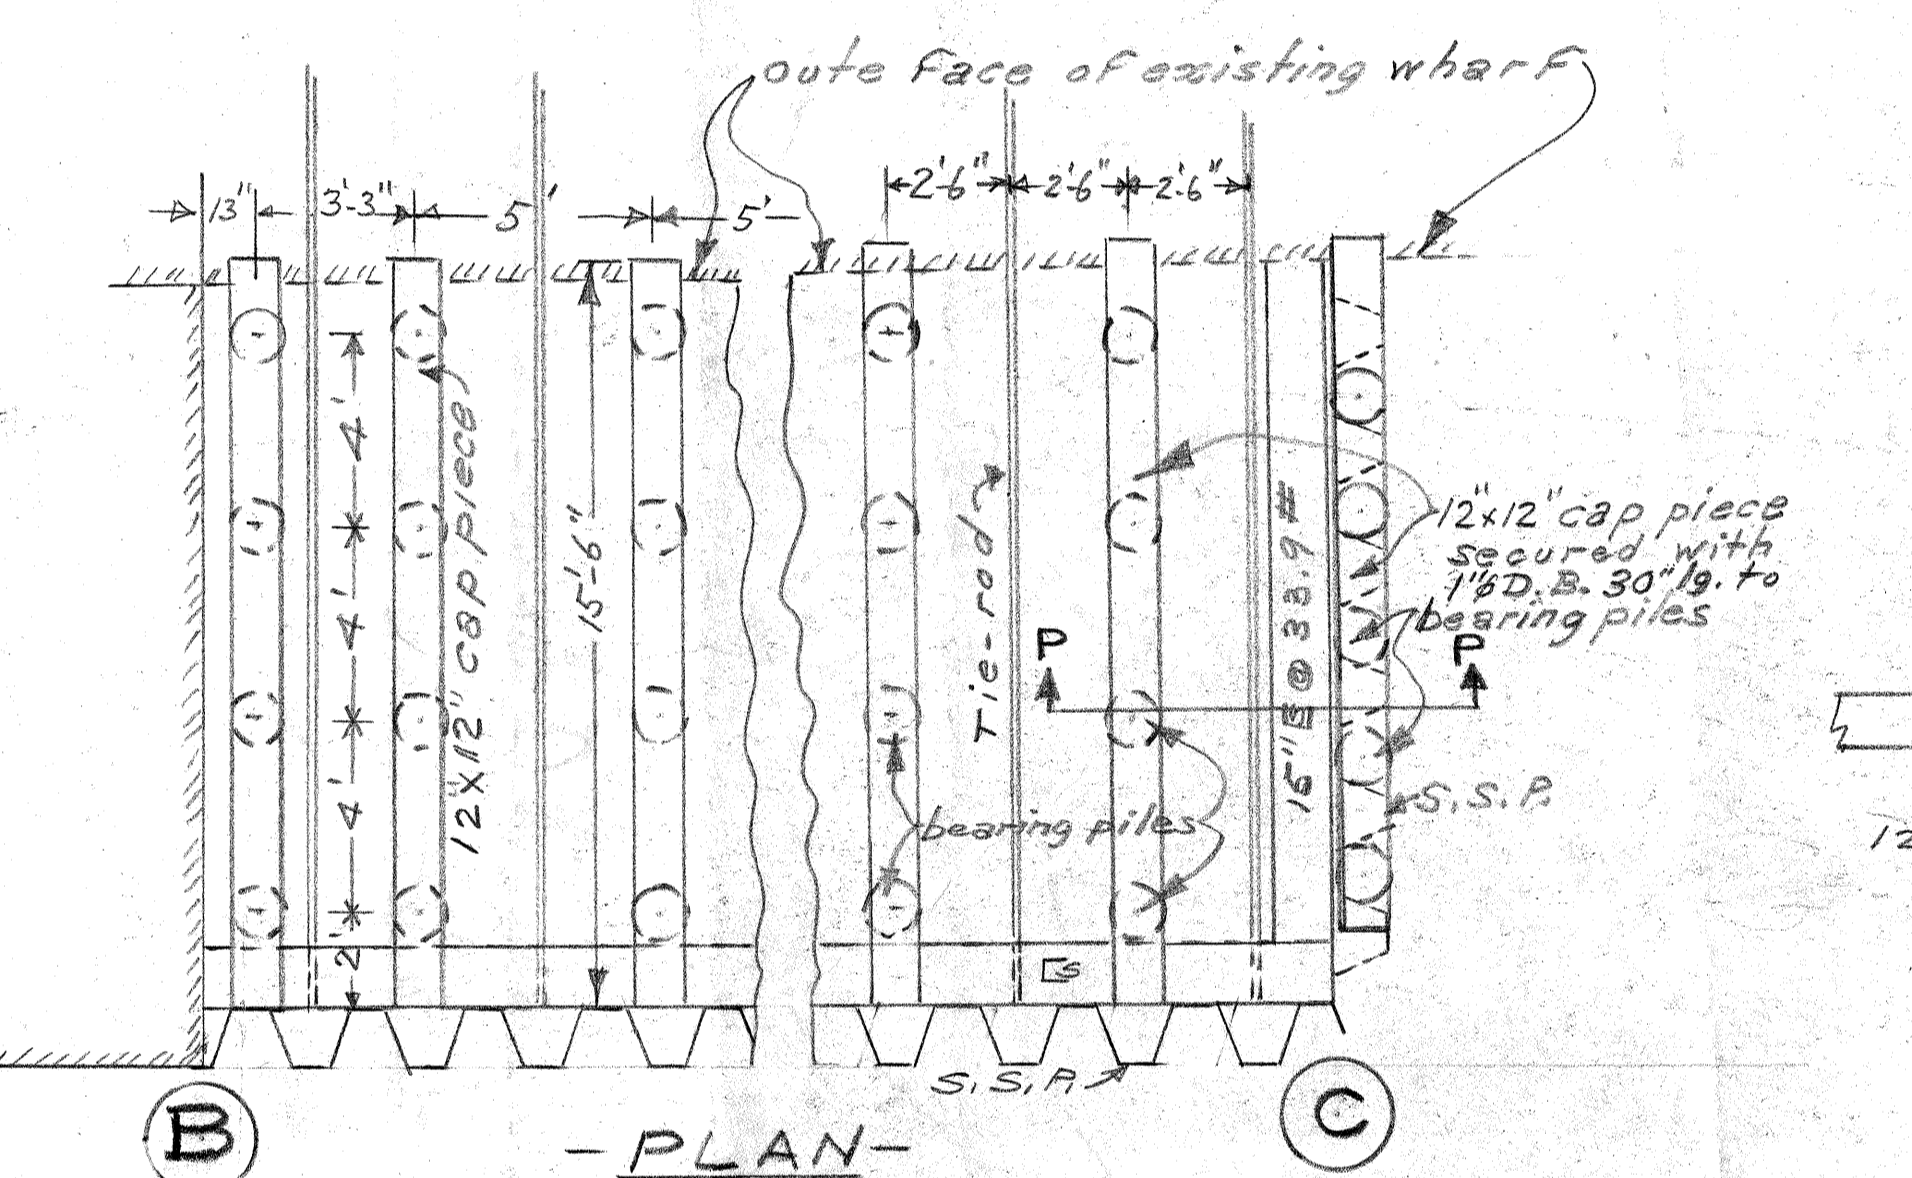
A-ARRANGEMENT OF CAP PIECES AND BEARING PILES
